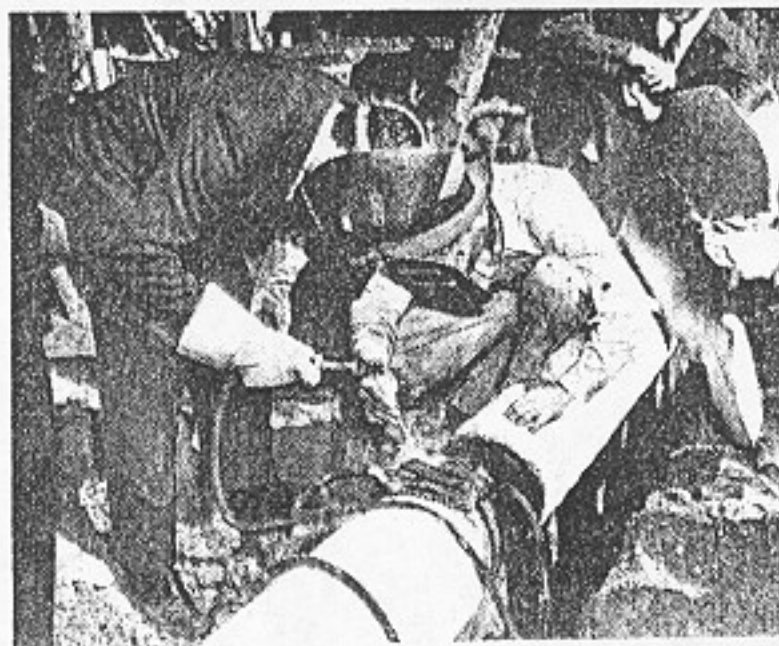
Arc welding an 83-mile pipe line (for aviation gasoline production) in 30 days.
